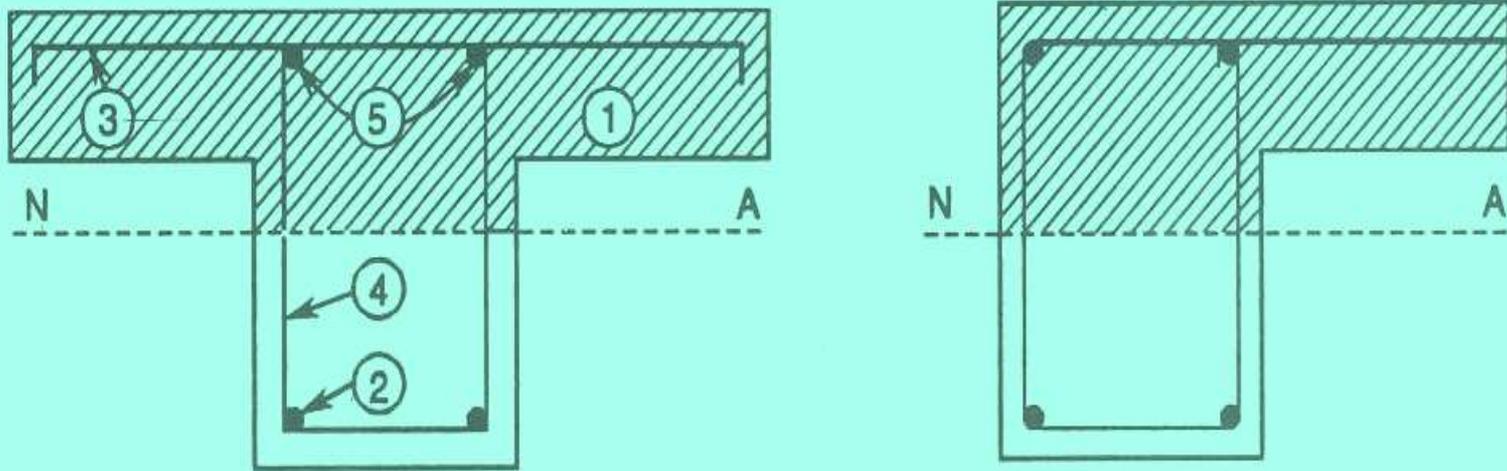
Flanged beams: (a) T beam—1-Compression in concrete; 2-Tension steel; 3-Transverse steel; 4-Stirrups for shear; 5-Anchorage of stirrups; (b) L beam.
